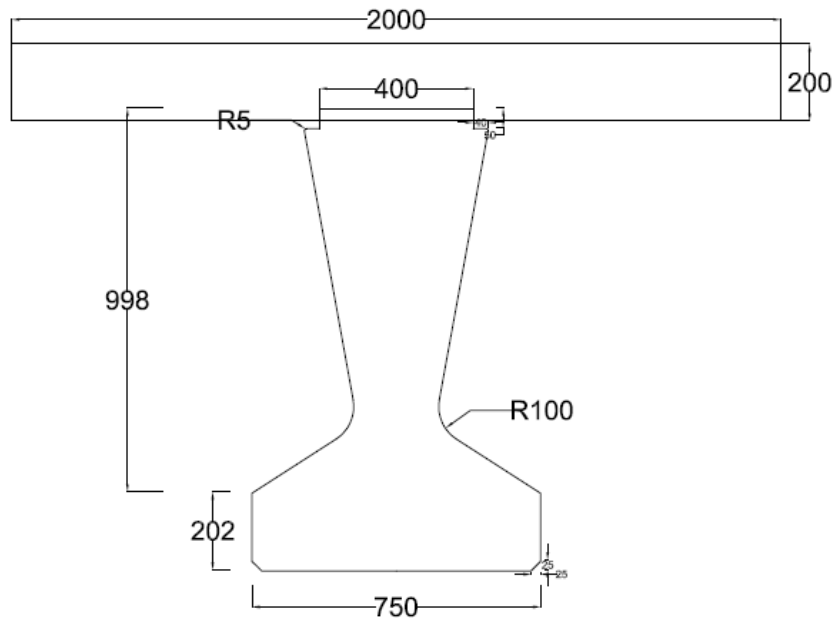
Cross-section of the composite beam (all dimensions are in mm)
